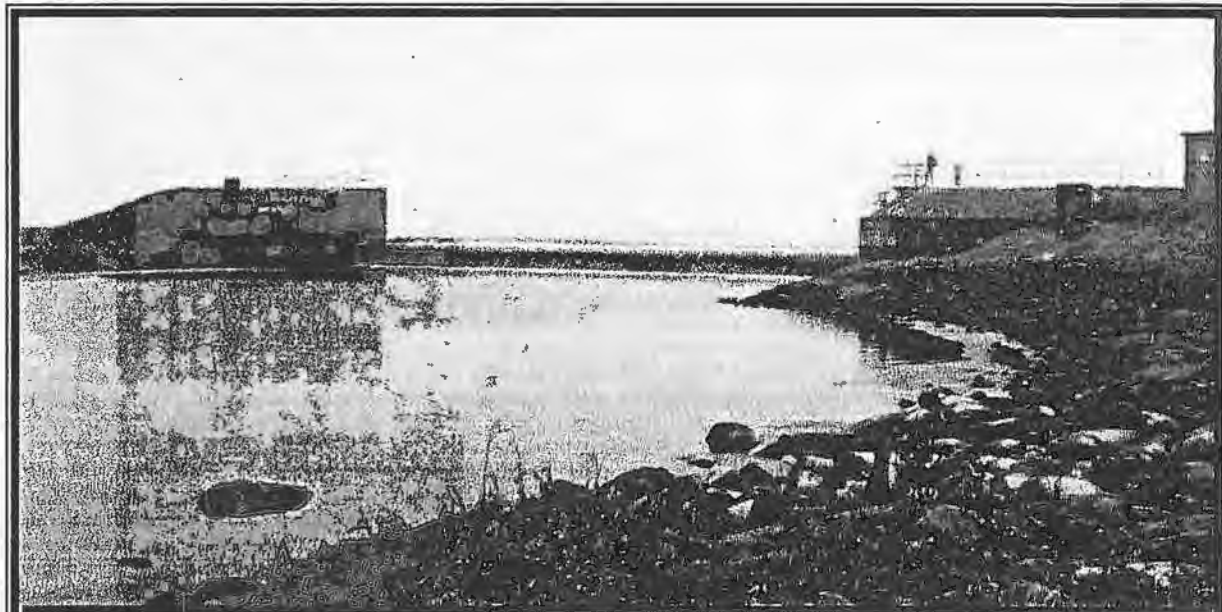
Lac qui Parle: Marsh Lake Dam Outlet Structure
